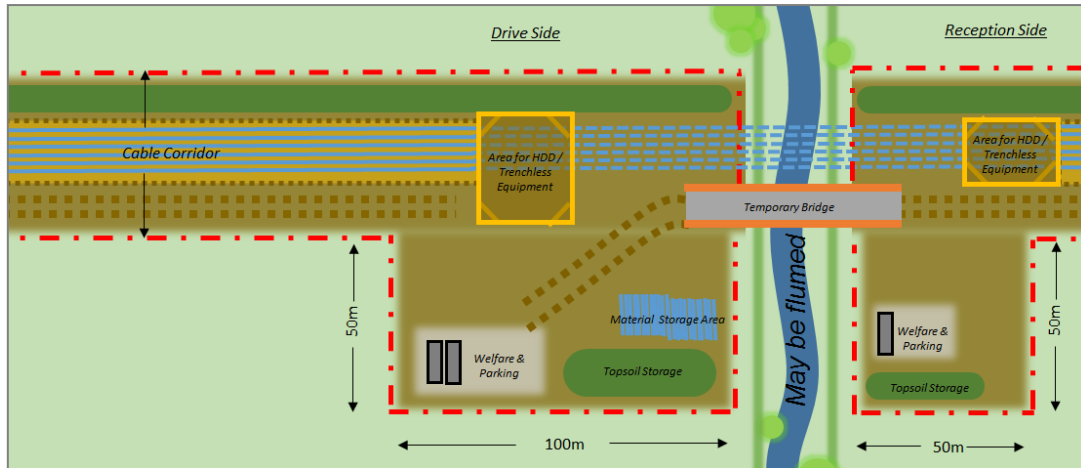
Indicative trenchless river crossing with temporary bridge
